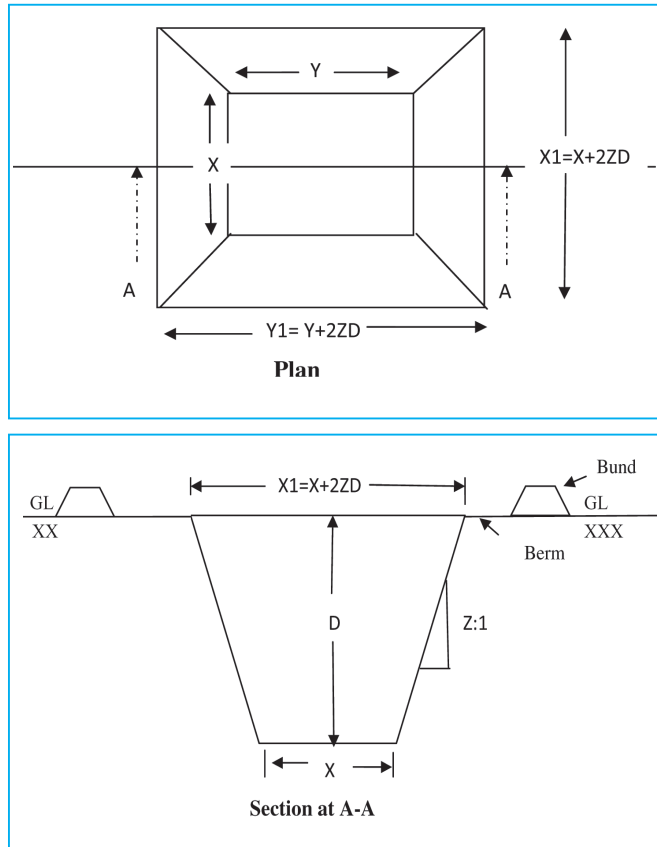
(a) : Plan and section view of square shaped dugout farm pond
